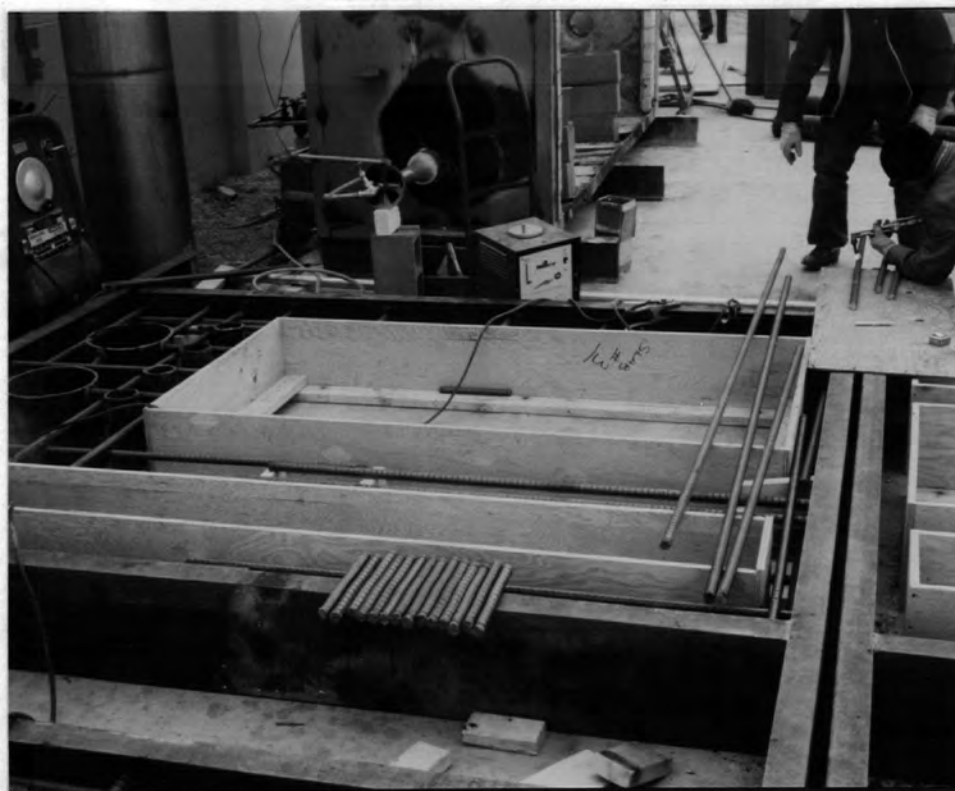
PLACEMENT OF PIPE PENETRATION AND REBAR
